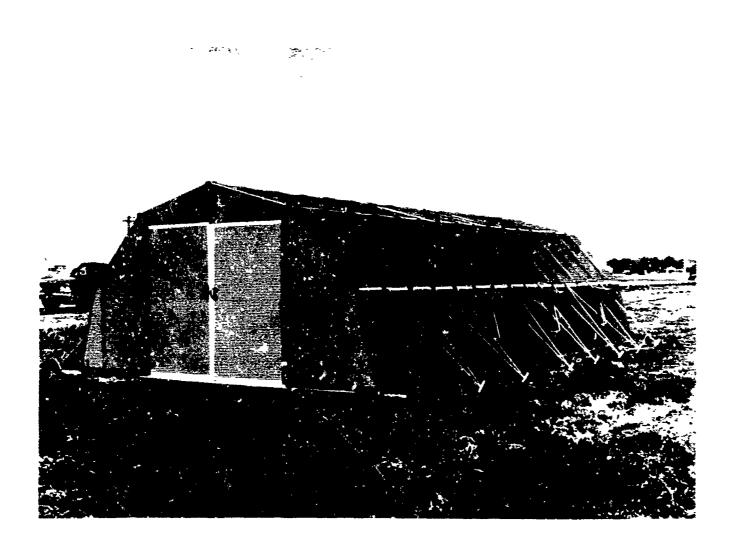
SHELTER #2 FIELD TEST, LANGLEY AFB (COMPLETED SHELTER SHOWING LARGE DOOR END)
